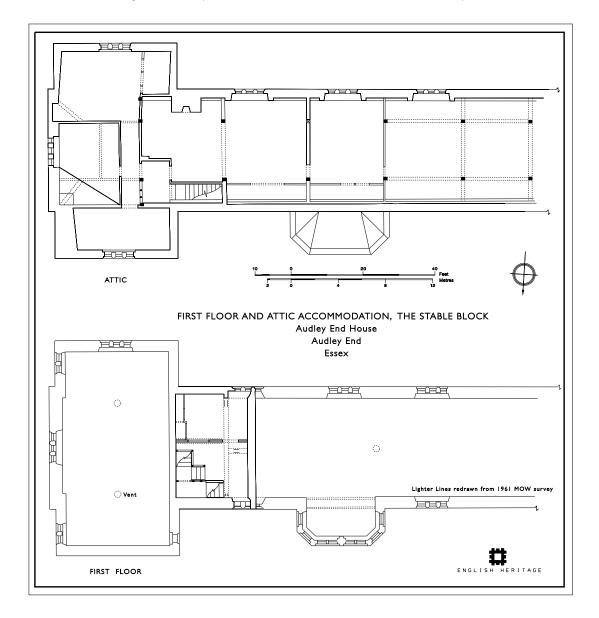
Plan of the first floor and attic at the east end of the stable building. © English Heritage
